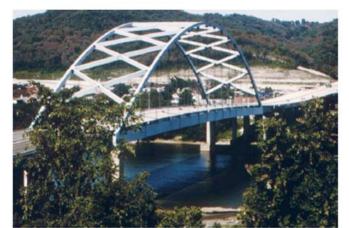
Photo of the I-470 Bridge over Ohio River, Wheeling, West Virginia
